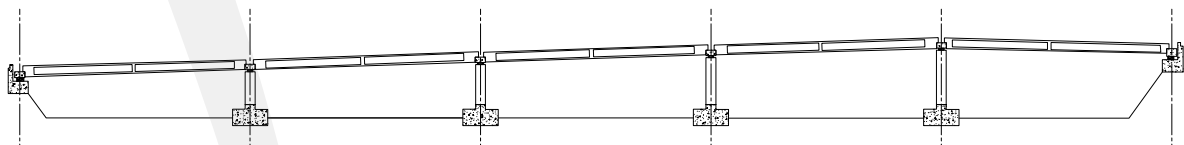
Detail of the varying bearing elevations of the girders.
